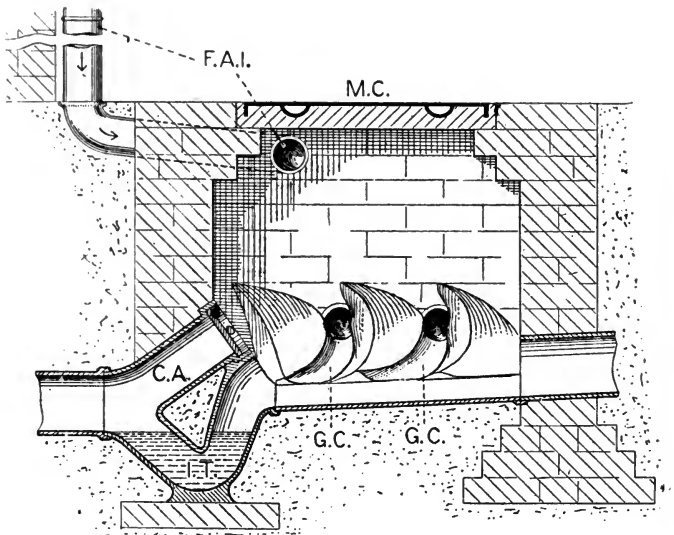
Section of access or inspection chamber or manhole with intercepting trap. F.A.I., Fresh air inlet; M.C., manhole cover; G.C., glazed channels in floor of manhole connected with branch drains; C.A., clearing arm; I.T., intercepting trap.
